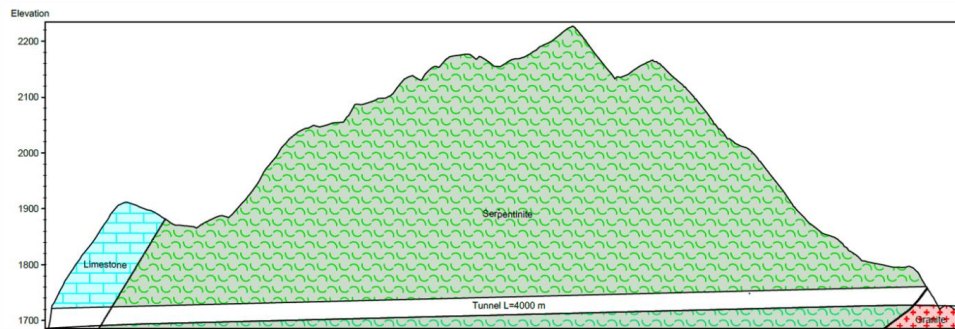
Longitudinal cross-section of Yüksekova T-1 tunnel
